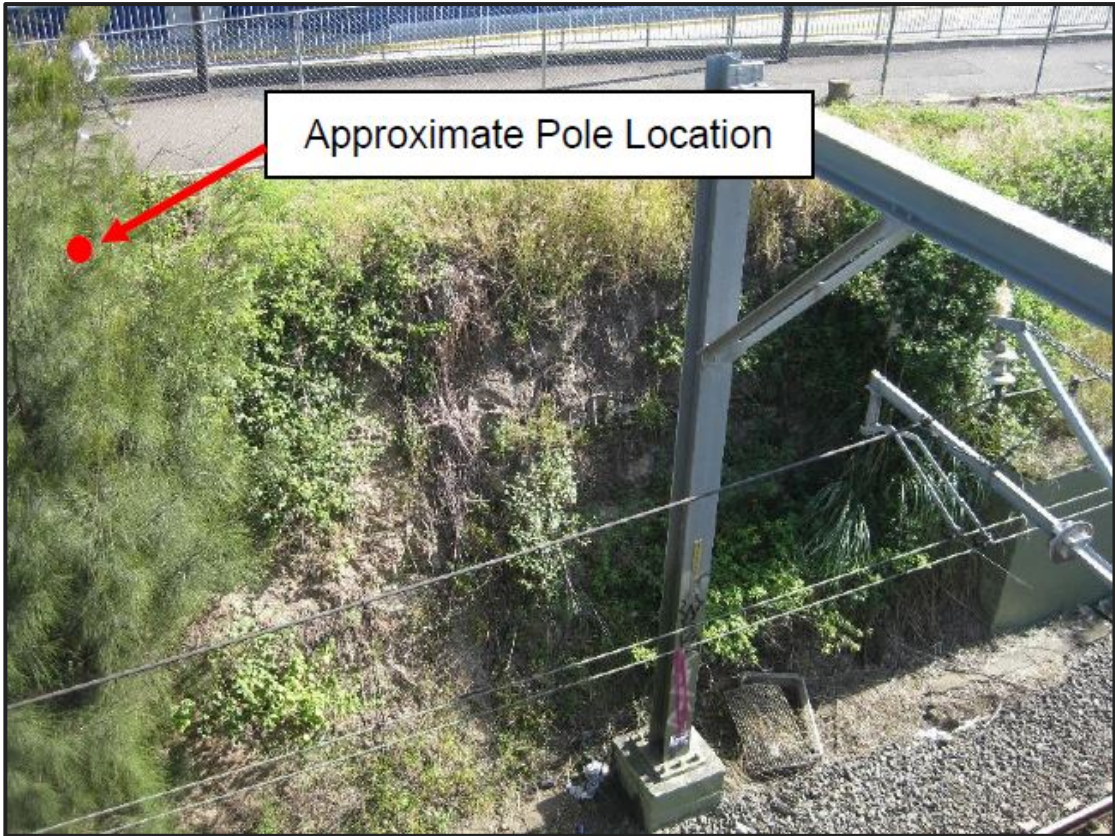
| Proposed sign location (Source: Applicant's Geotechnical Report)
